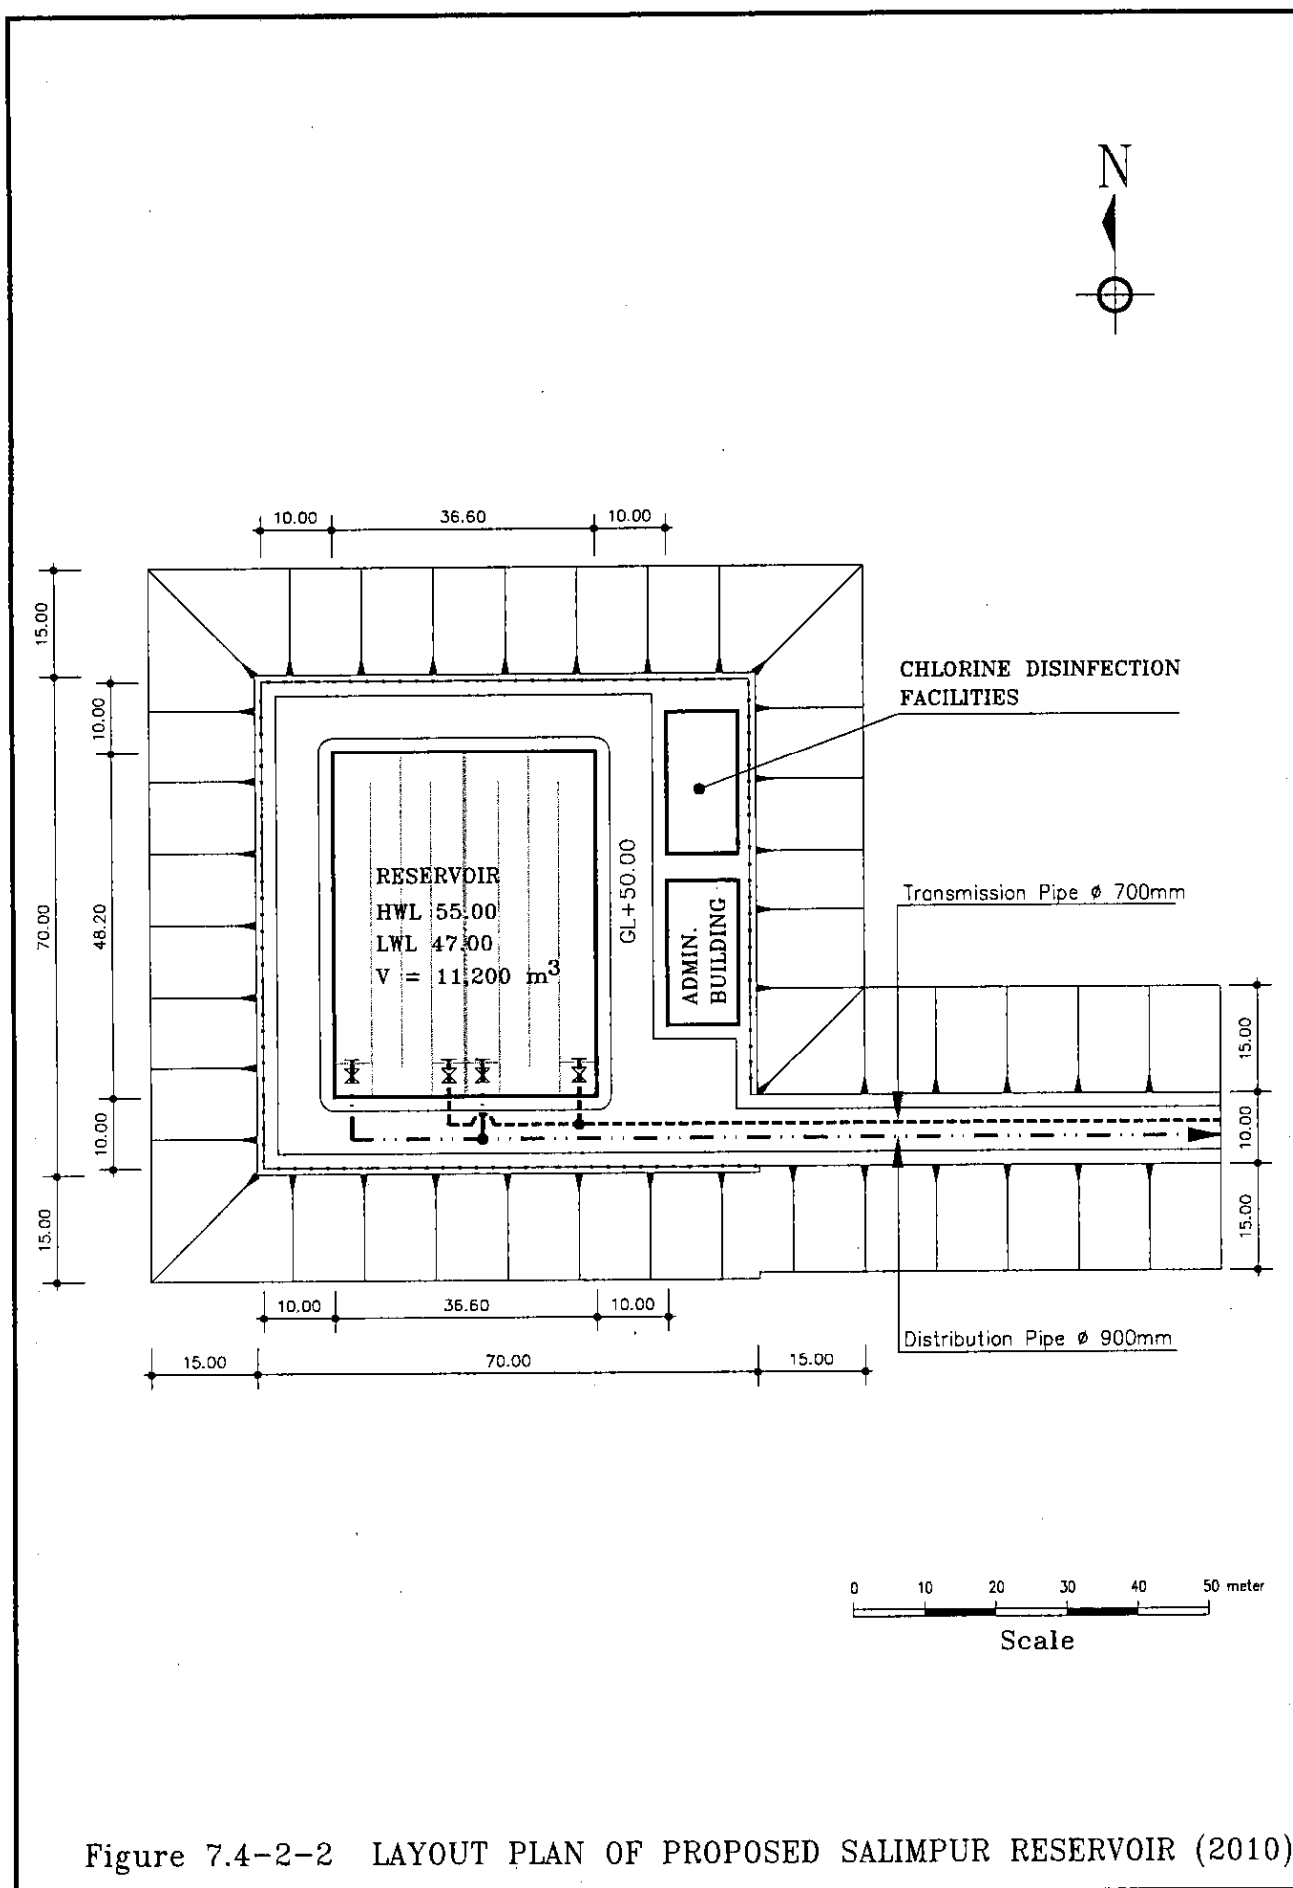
LAYOUT PLAN OF PROPOSED SALIMPUR RESERVOIR (2010)
